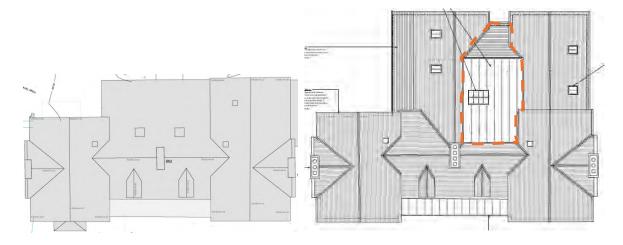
Existing roof plan (plan 08) and proposed roof plan (plan 38).
